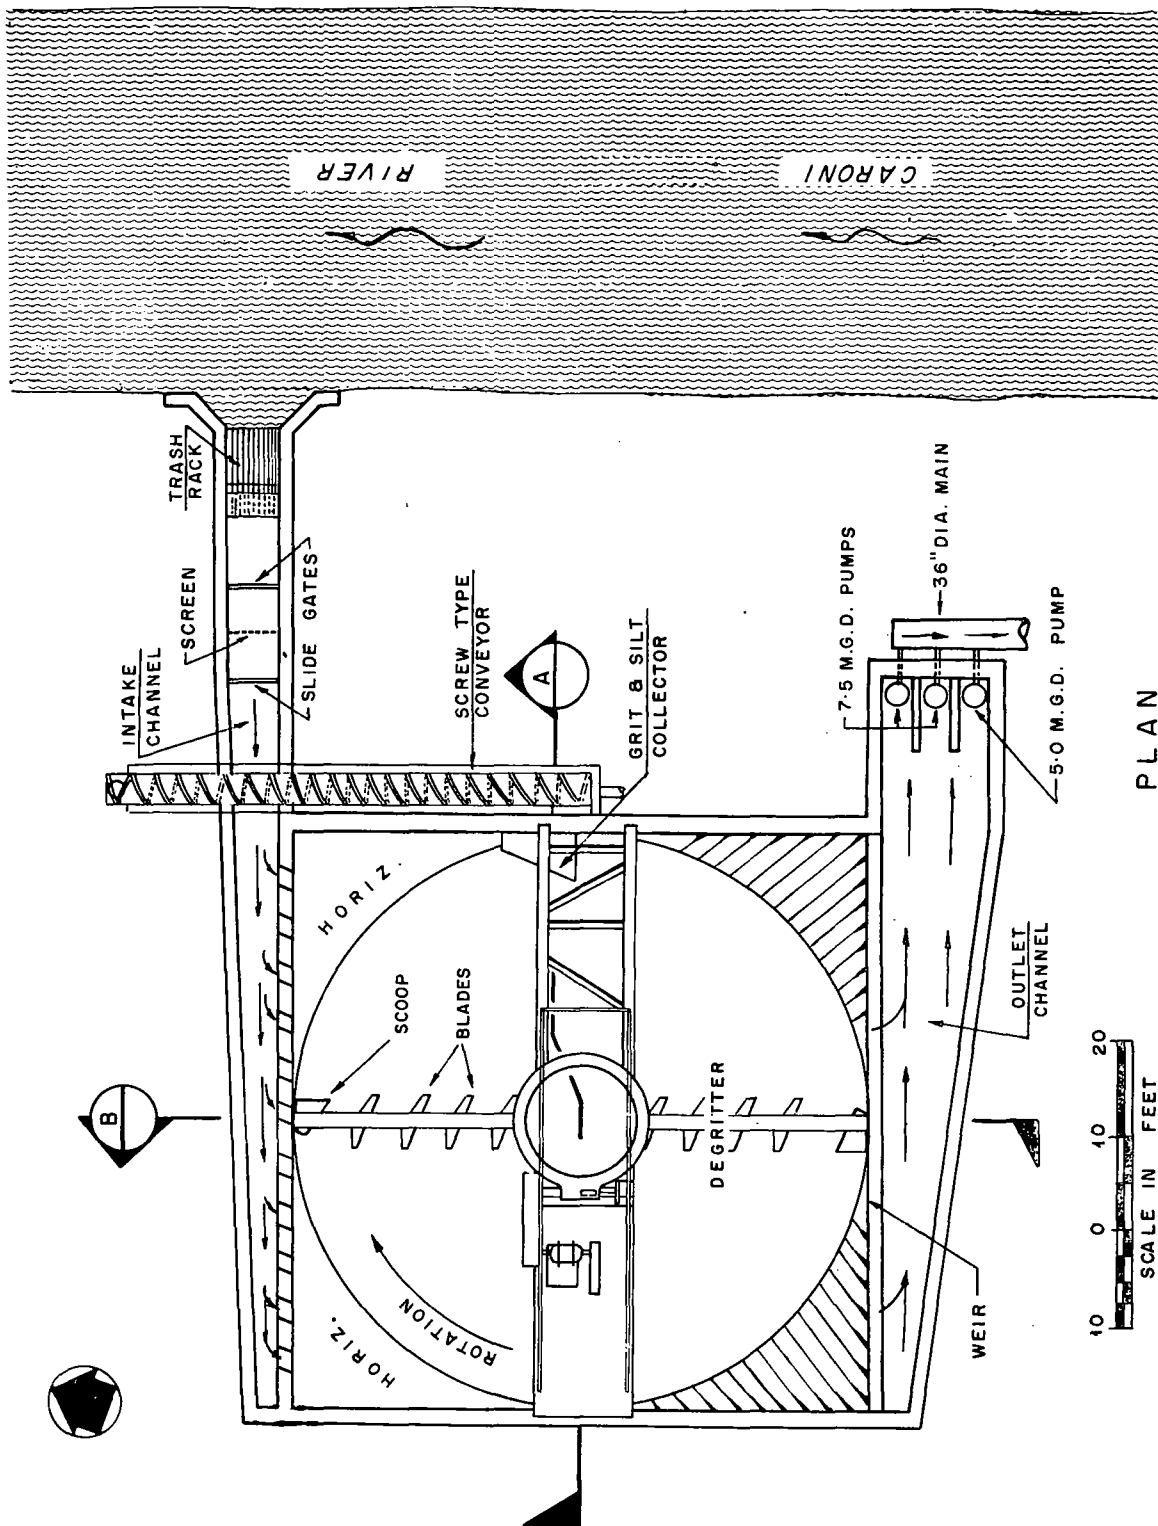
DETAIL PLAN SAN RAFAEL INTAKE
